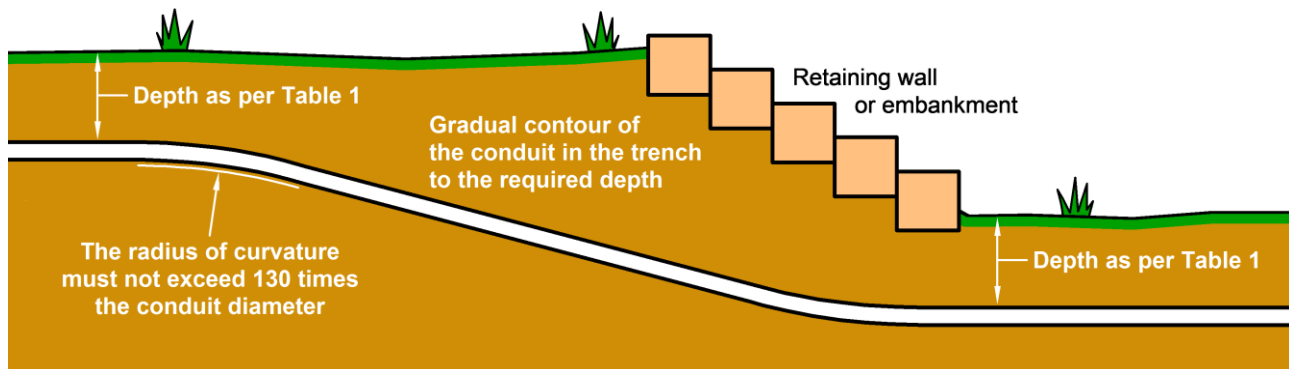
Trenching/Conduit Arrangement with a retaining wall or embankment with a gradual slope
